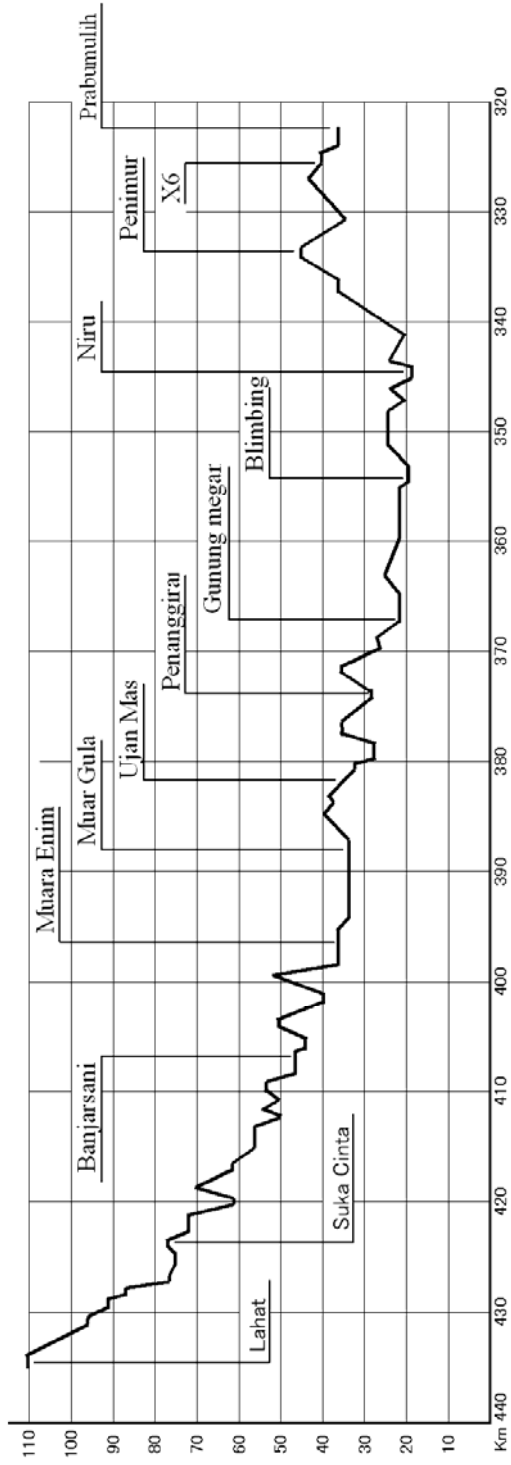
Track Layout for the Section between Lahat and Kertapati
